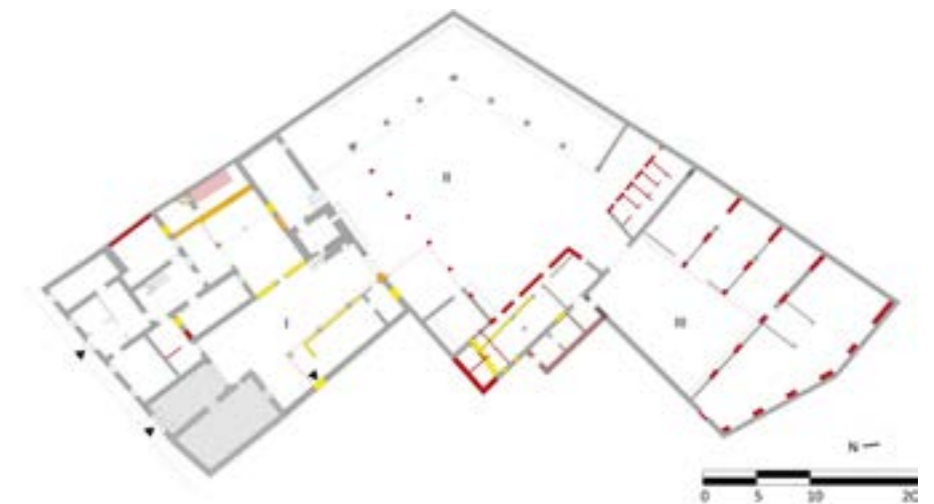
Demolition and reconstruction plan. The demolition is marked in yellow and the new construction in red
